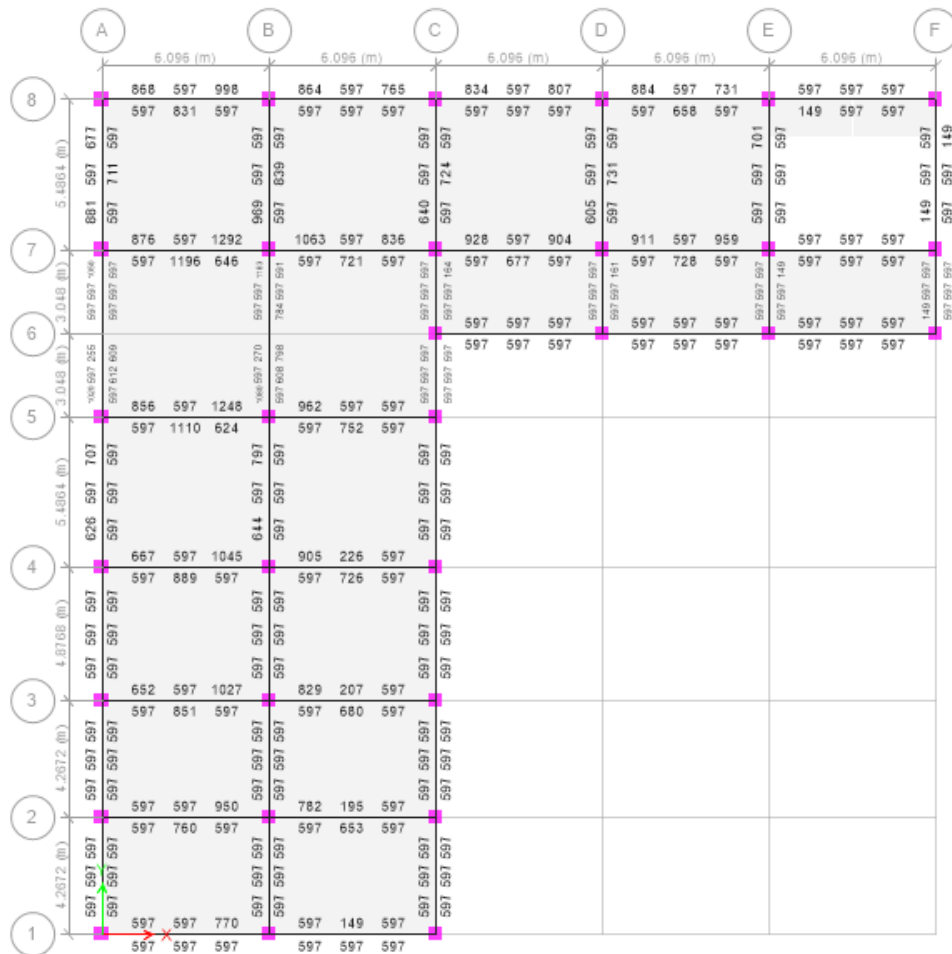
Longitudinal Reinforcement Area of 1st floor beam
